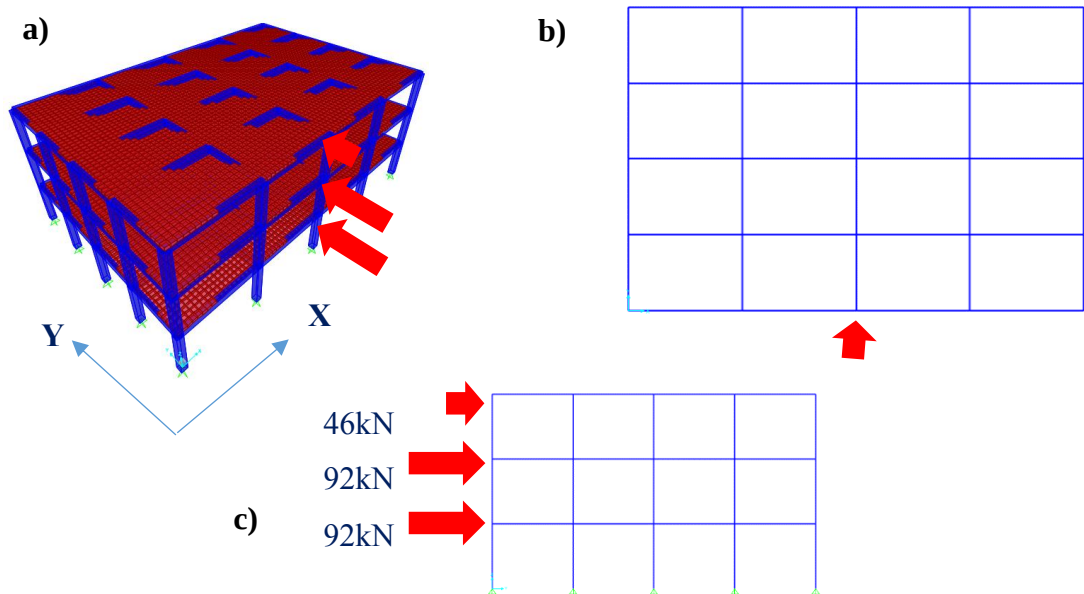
Wind load application in the y-direction a) 3d view, b) plan view, c) elevation view
